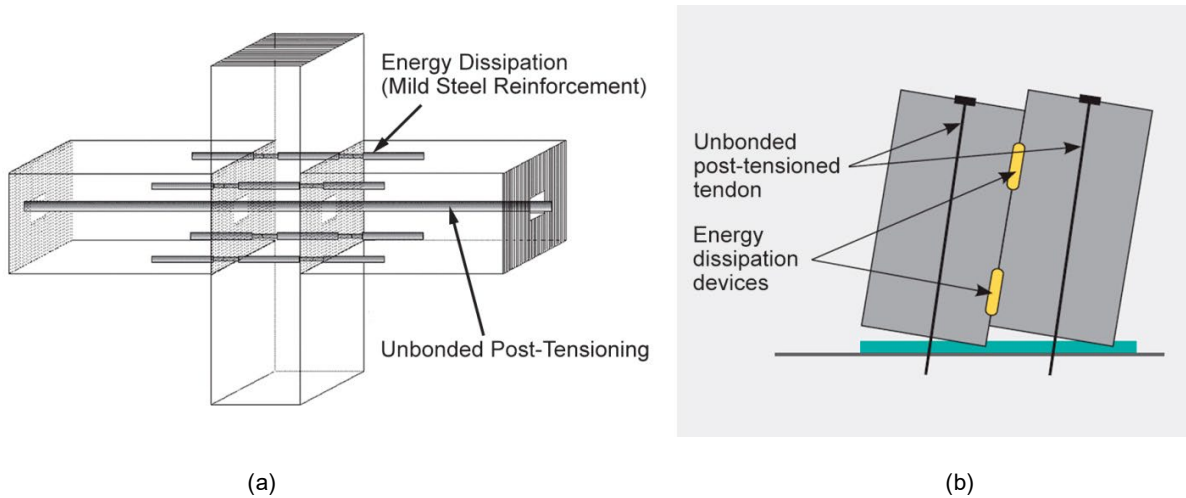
Post-tensioning details of (a) a beam-column frame structure, and (b) a wall system.
